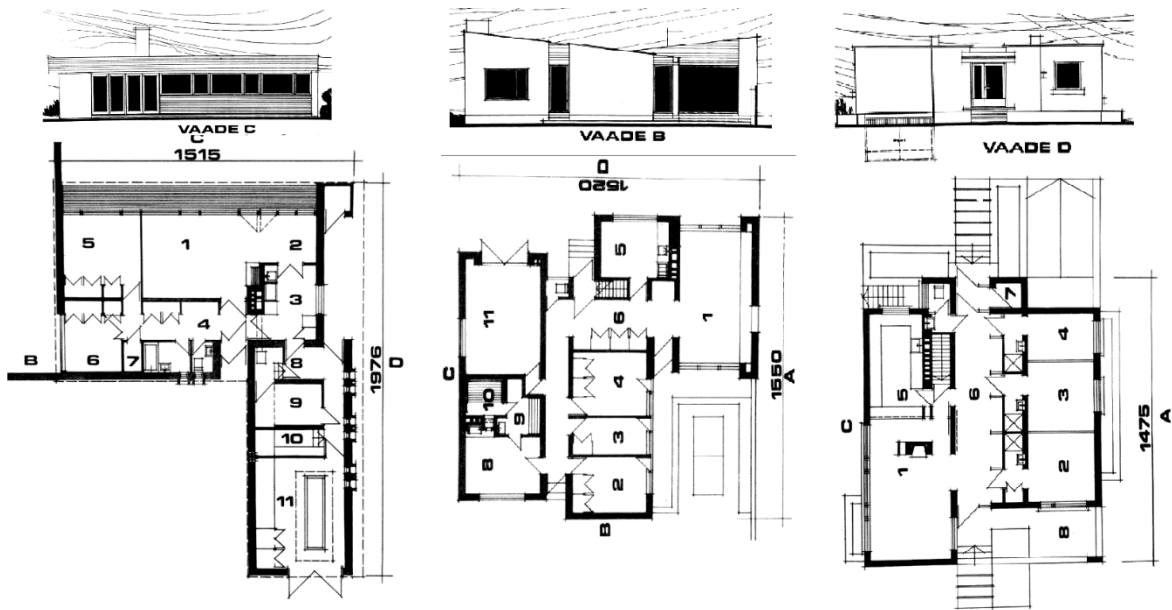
Bungalow dwellings from 1976 (left to right with elevation and layout: 106-74, 92-74, 83-74) (Berends & Dobrõš, 1976)
